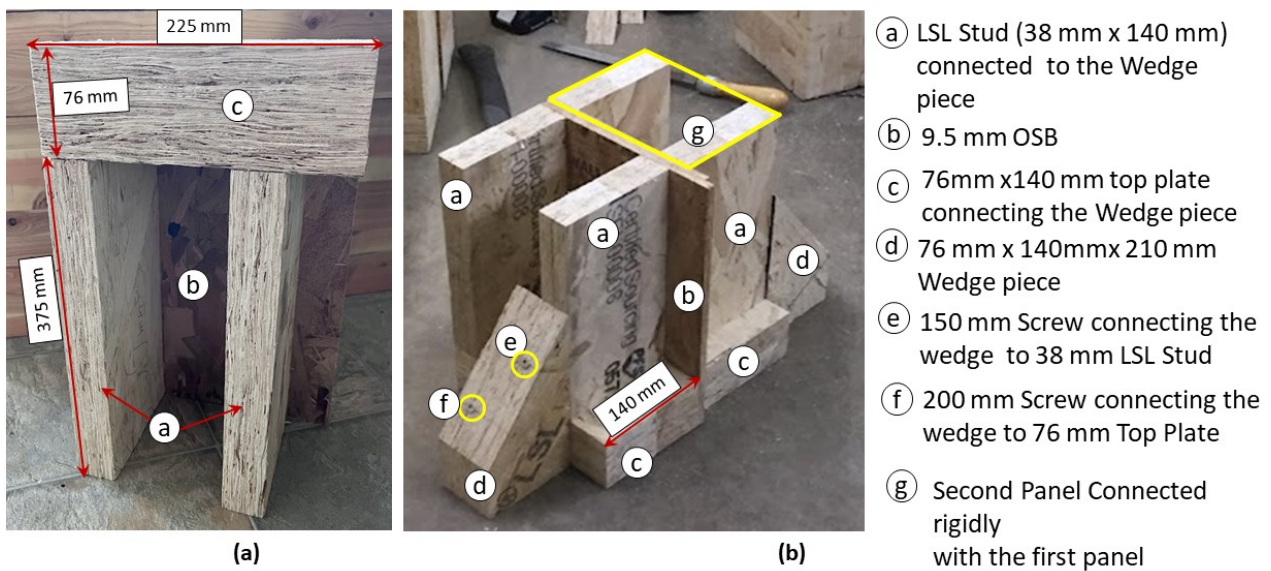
(a) 225 mm x 410 mm Panel fabrication (b) complete Connection-B specimen.
